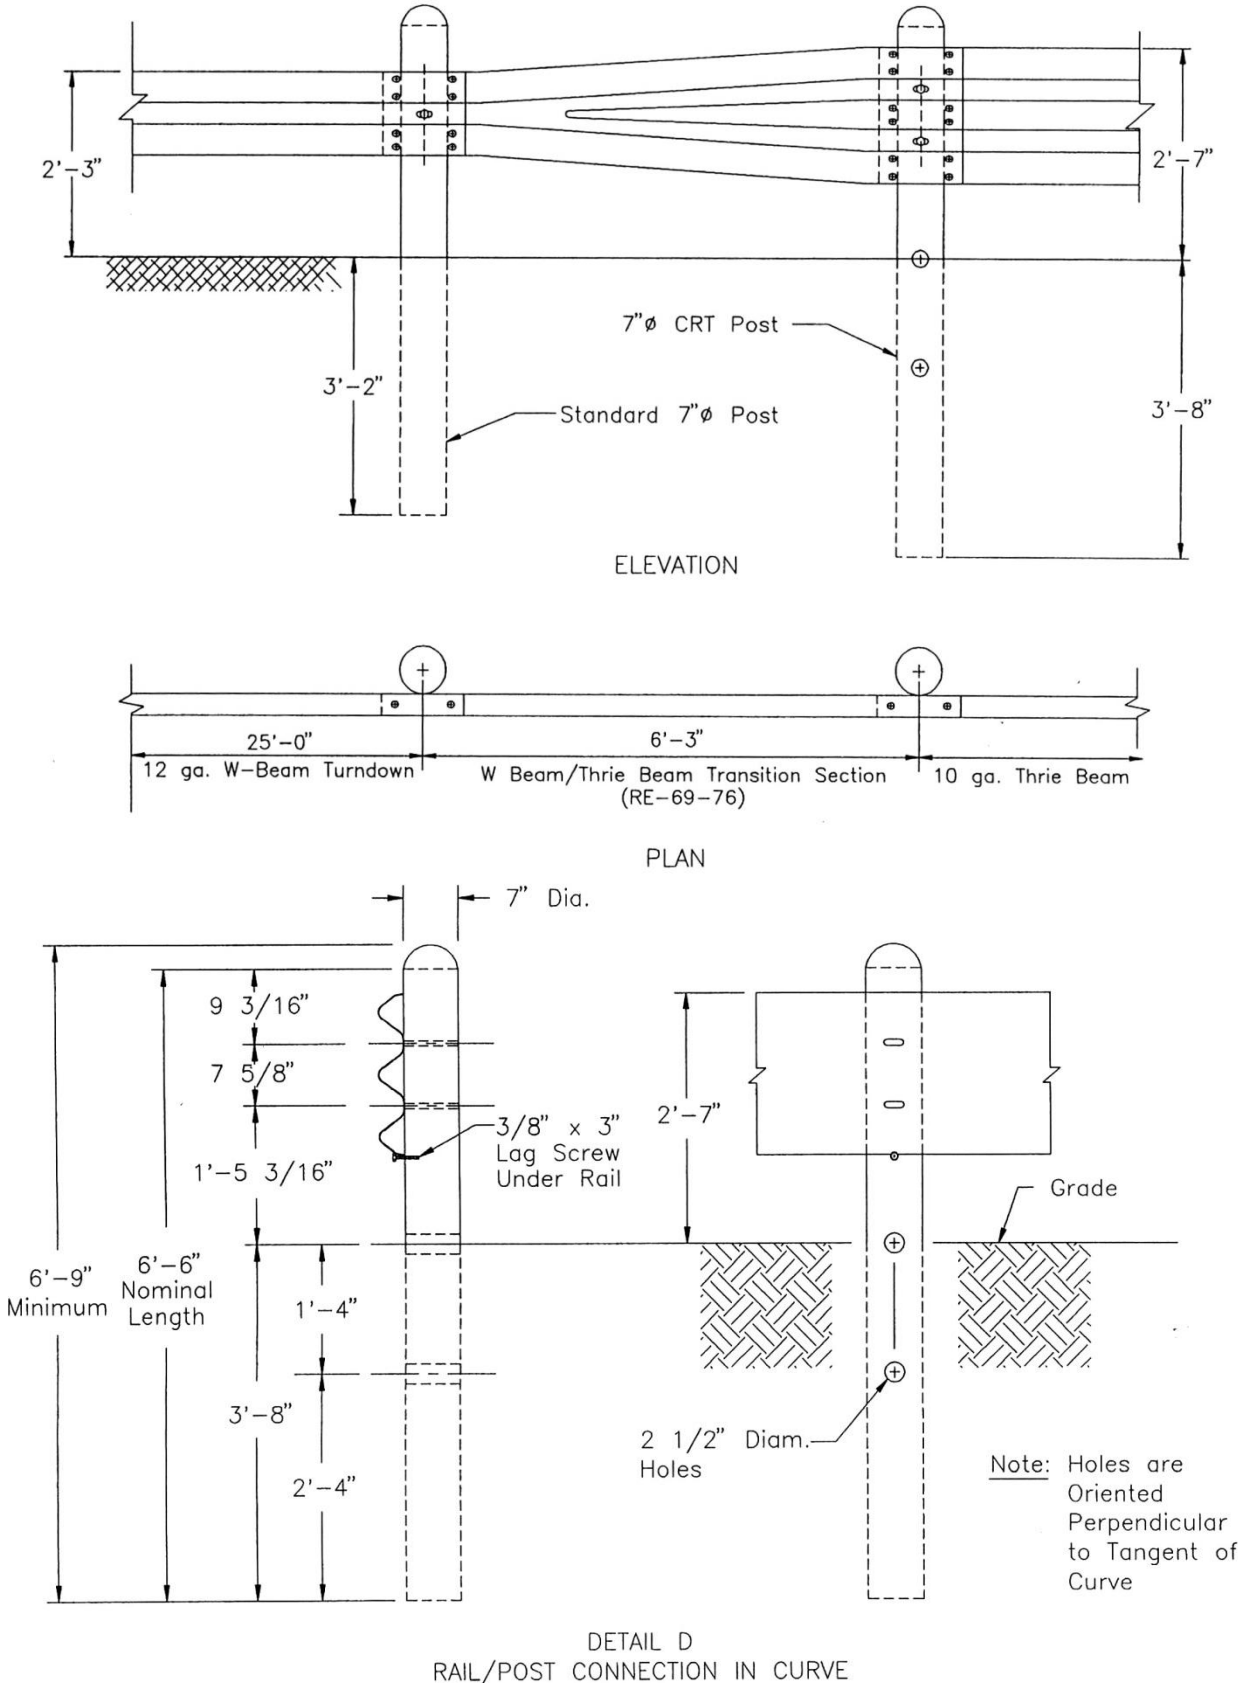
Rail-to-Post Connection Details, TTI Thrie Beam Short Radius System [8]
